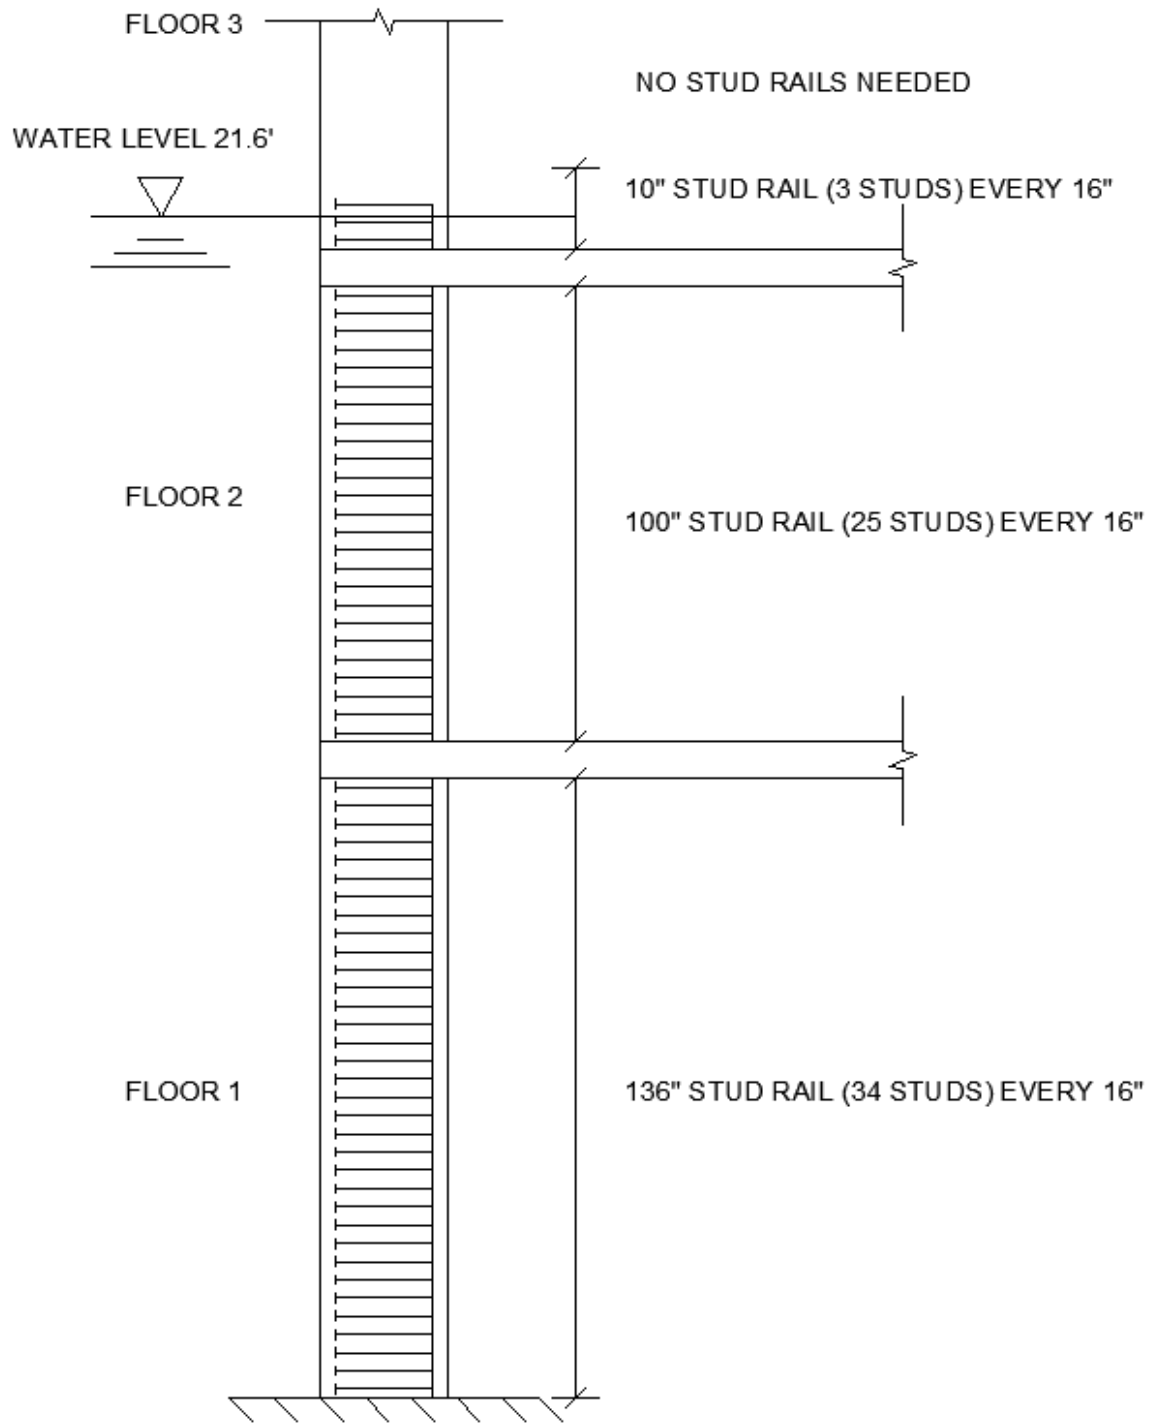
Stud Rail Diagram for the Floor 1 – 3
